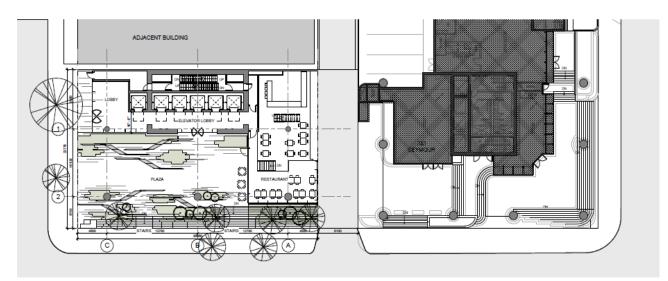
Level 1 Floor Plan with public plaza, including 333 Seymour Street
